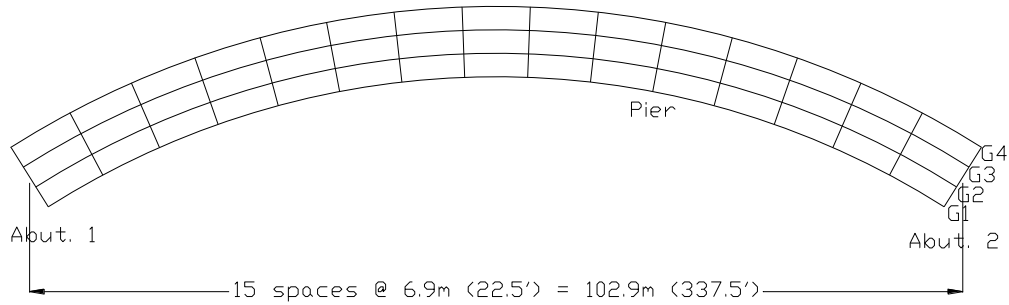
Simplified Framing Plan, Unbalanced Two-Span, 4-Girder, 91-m (300-ft) Radius Bridge, R/L = 13.33.
